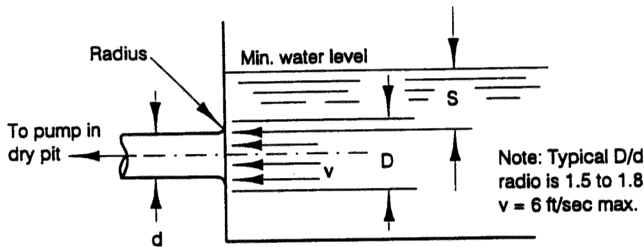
Elevation View—Horizontal Intake—Circular Section. (Courtesy of the Hydraulic Institute, 1994)
